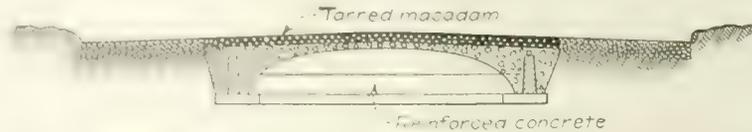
Cross Section of a Road With the Concrete Frame in Place.
